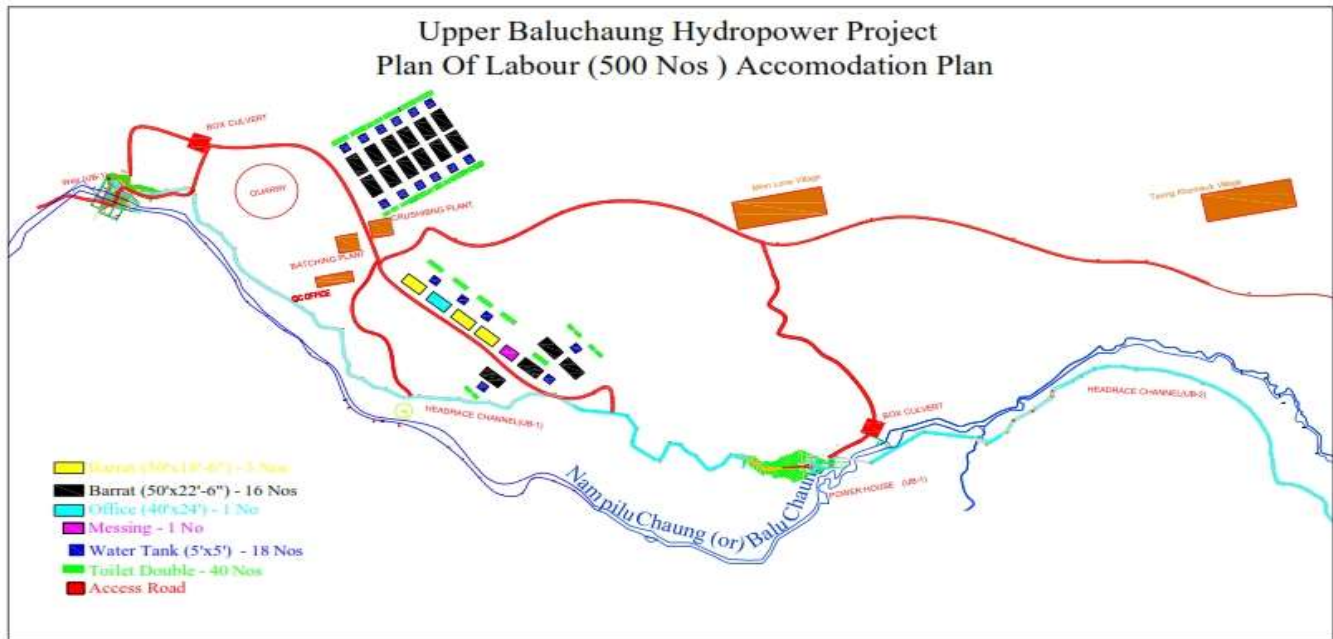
Plan of Labour (500 Nos) Accommodation Plan
